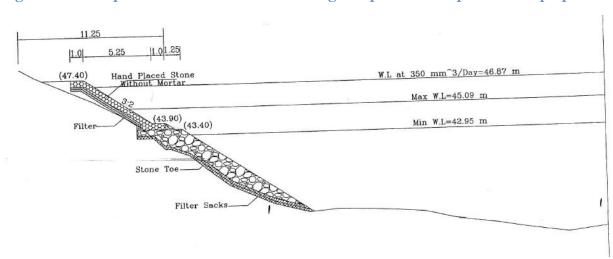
Example for a cross section illustrating components of a protection riprap
